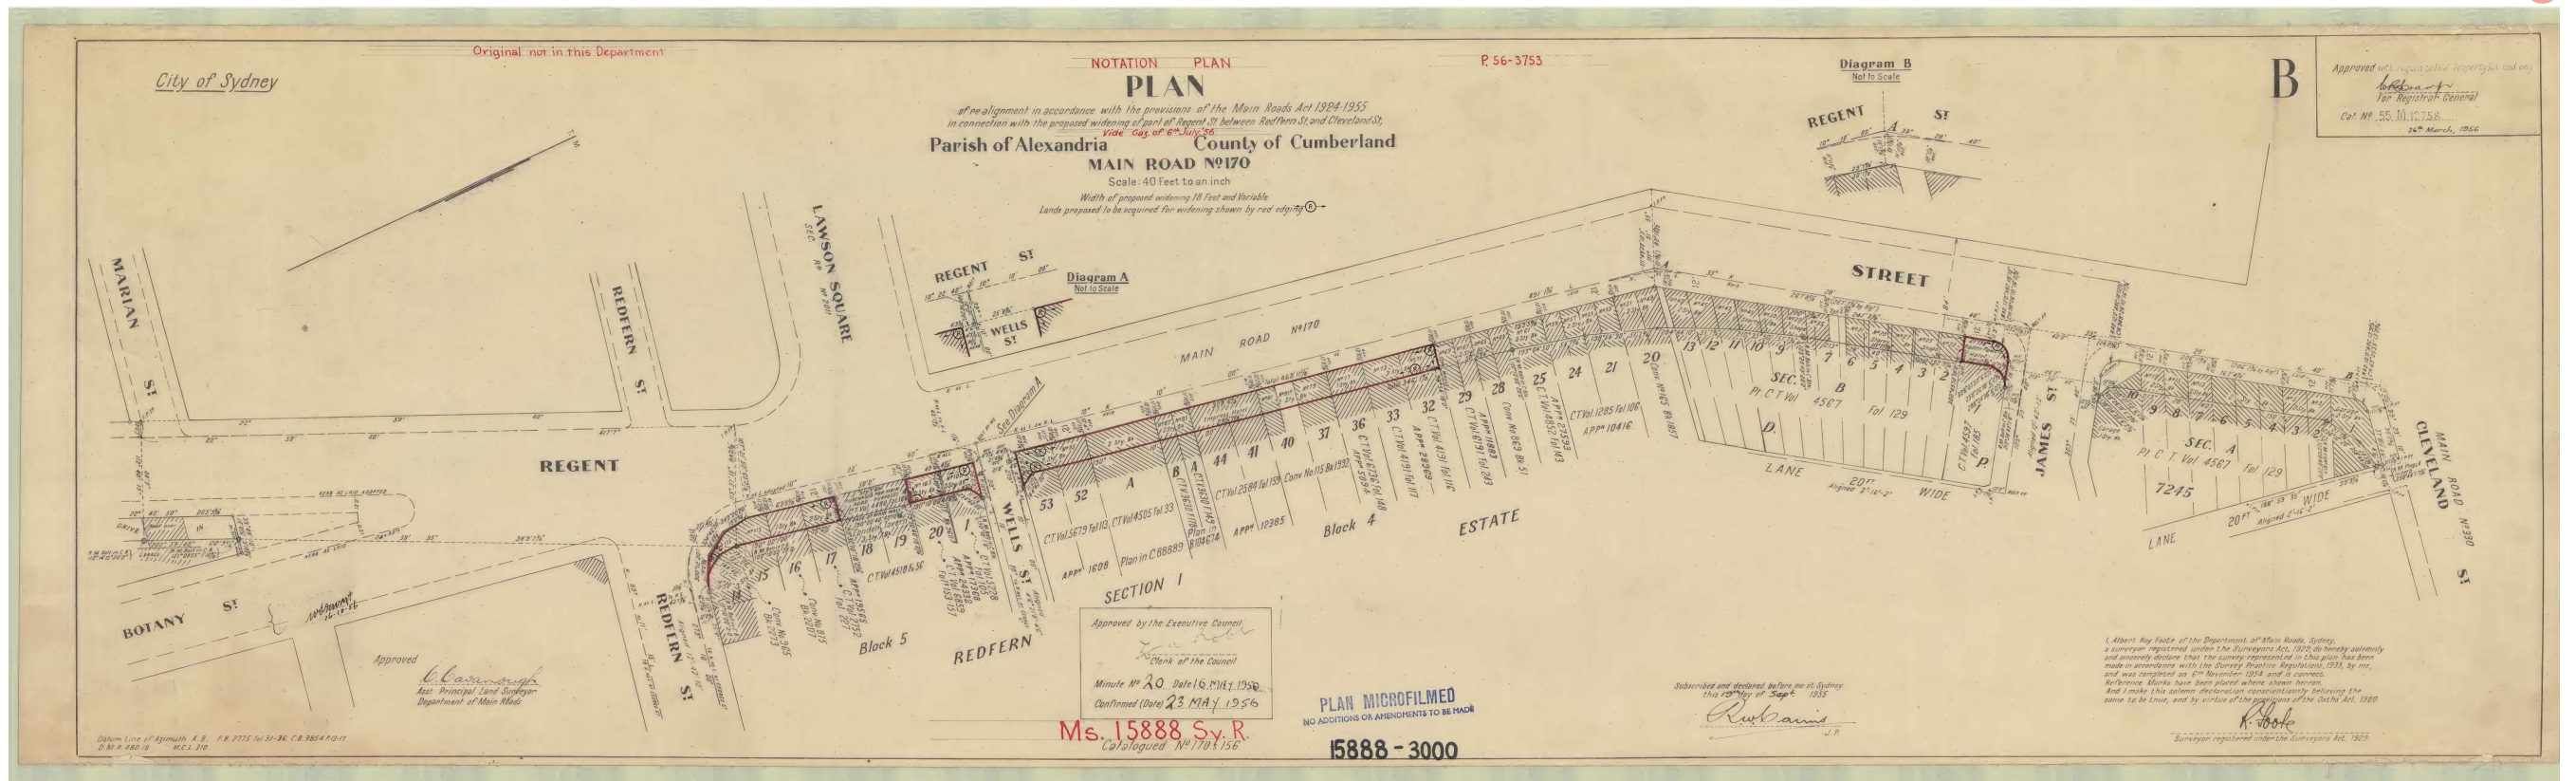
1956 Crown Plan 15888-3000 showing proposed Botany Road widening.
